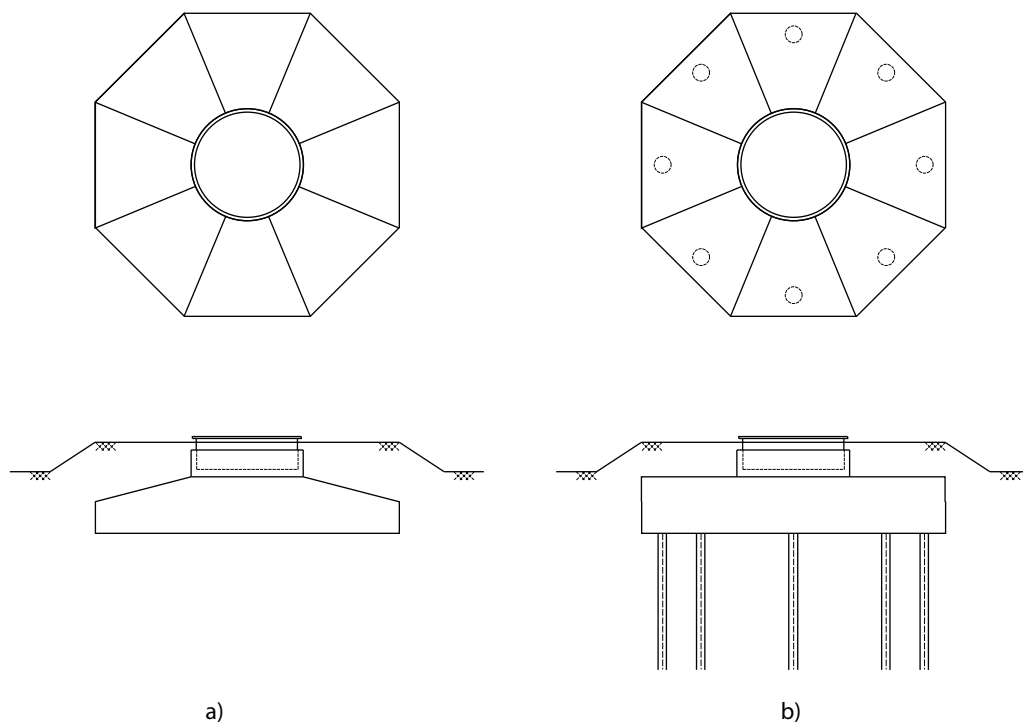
Examples of foundations for onshore wind turbines: a) slab foundation; b) pile foundation
